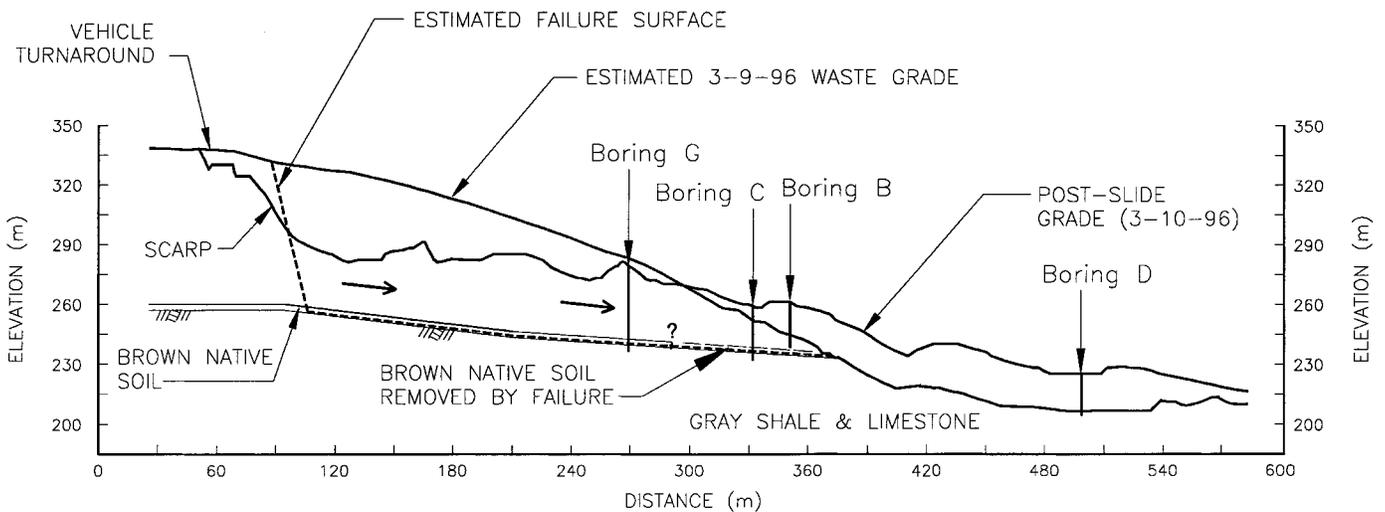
Slope Cross Section A-A' Showing Slide Mass Geometry and Boring Locations
